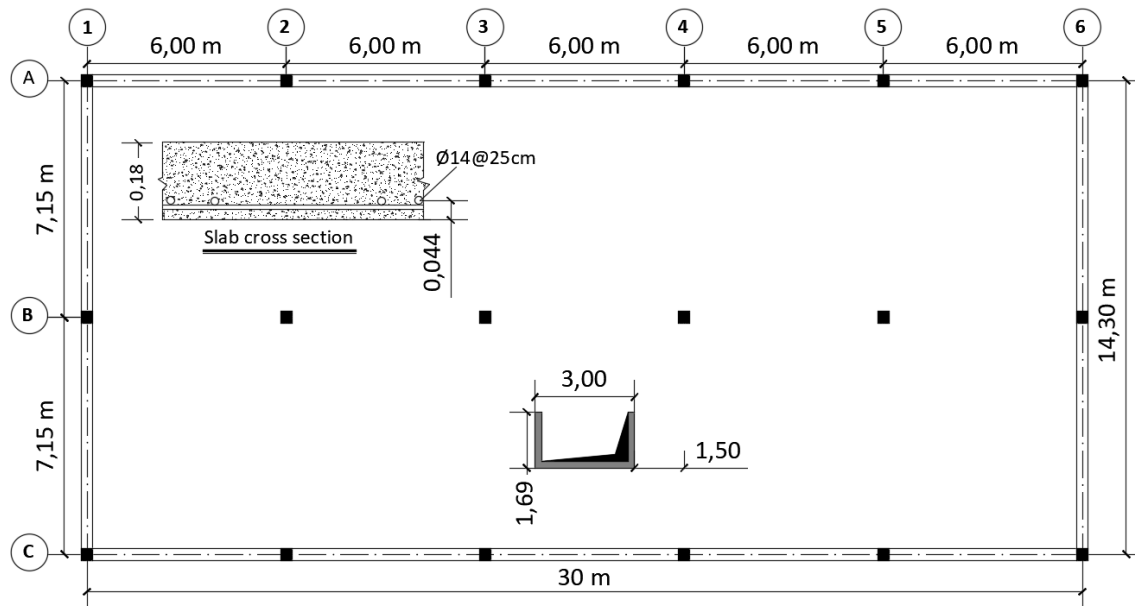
Plan of the office building and the slab cross-section as in Chapter 2, dimensions in meters.
